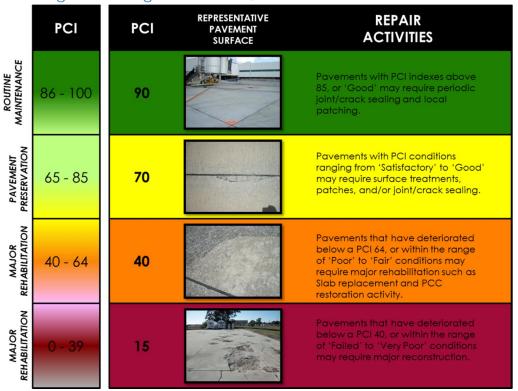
Rigid Pavement, Portland Cement Concrete
